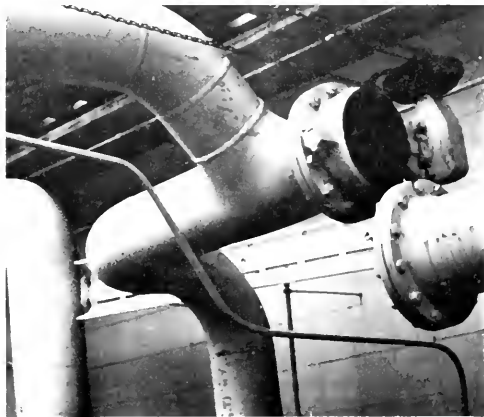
Broken piping, Central Heating and Air Conditioning Building.
